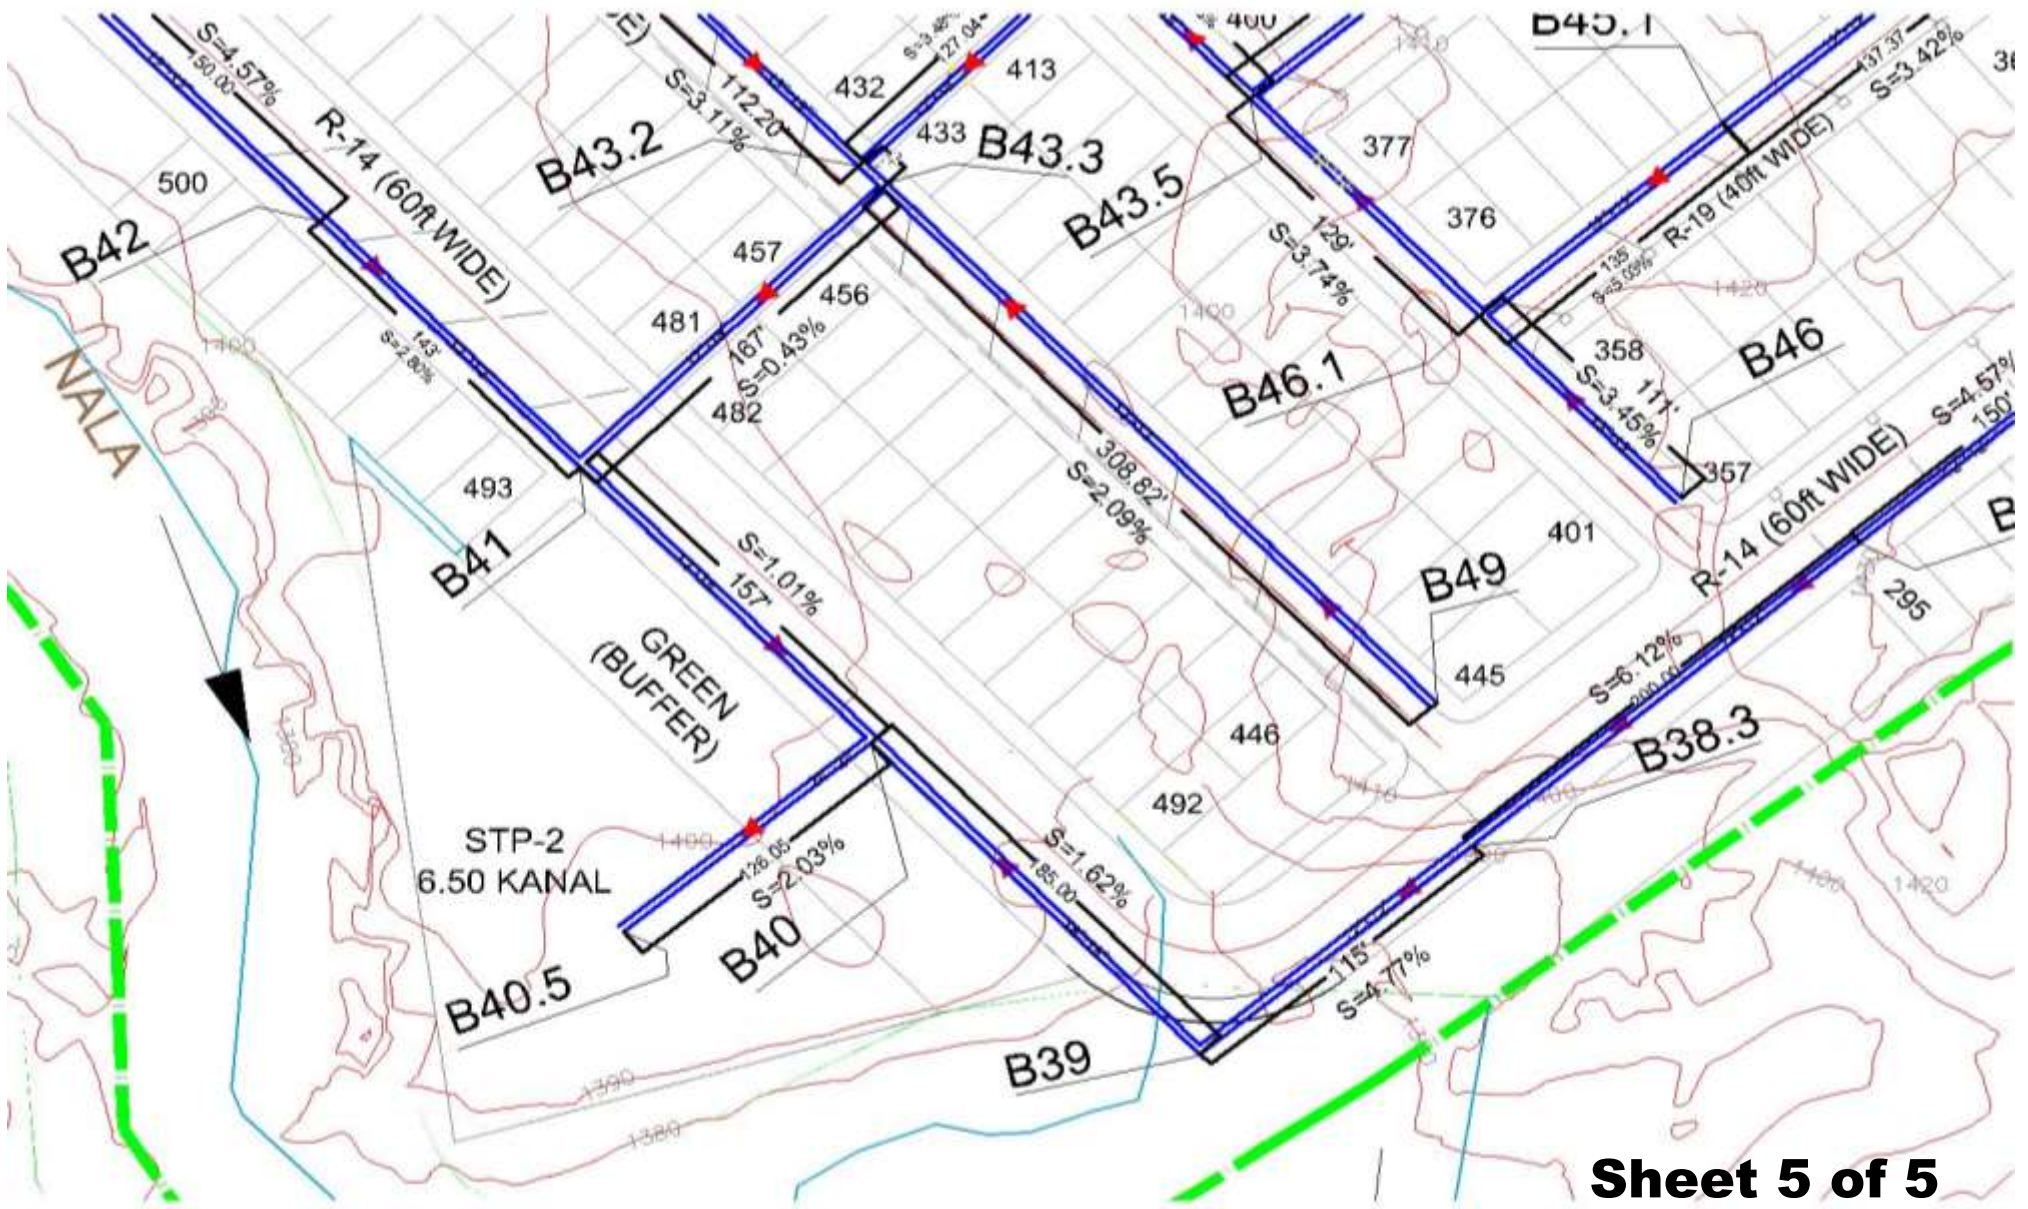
Storm drainage layout plan of Sub-catchment-4 part four
